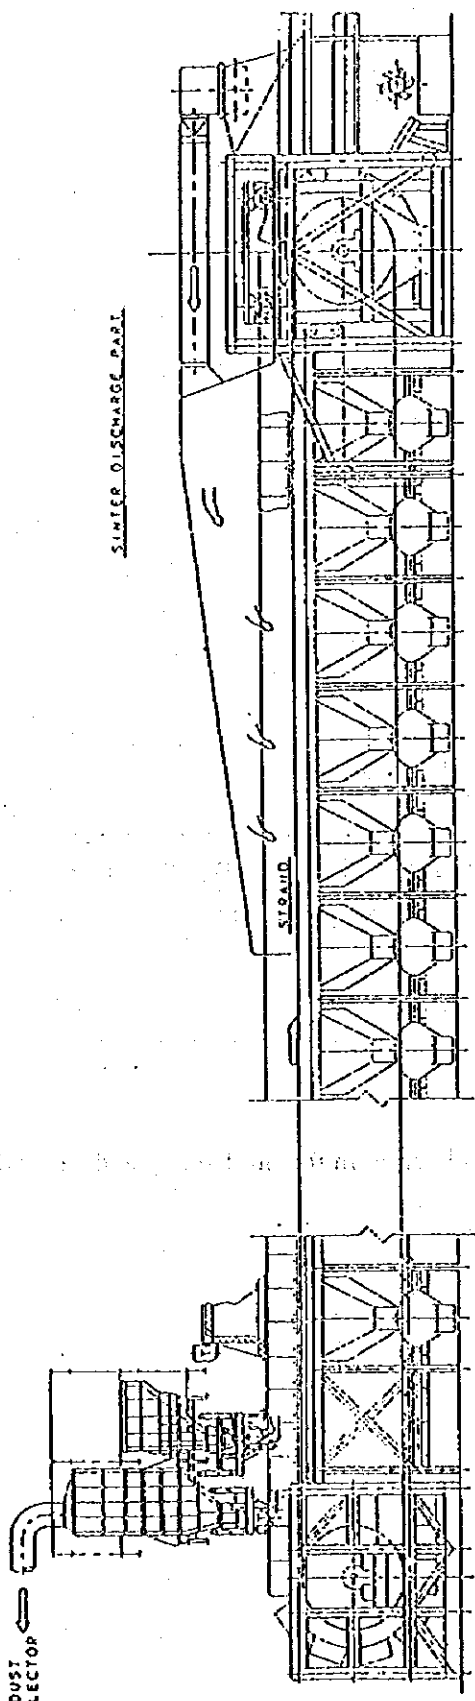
Typical drawing of dust collection in ore feeding and sinter discharging part
